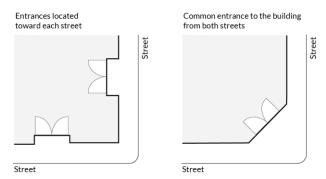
D.1.C: CORNER BUILDING ENTRANCES, NONRESIDENTIAL USES
